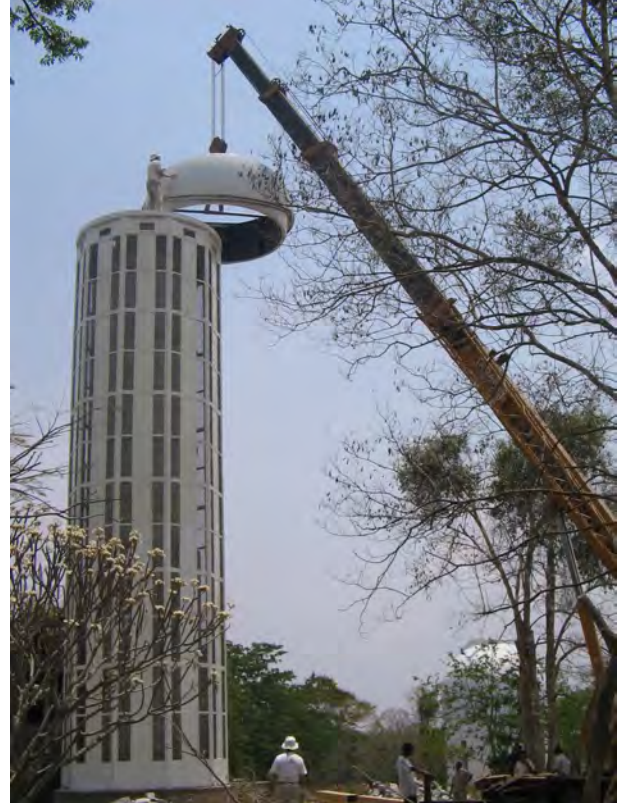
Lifting the clamshell dome to the top of the tower for installation.
